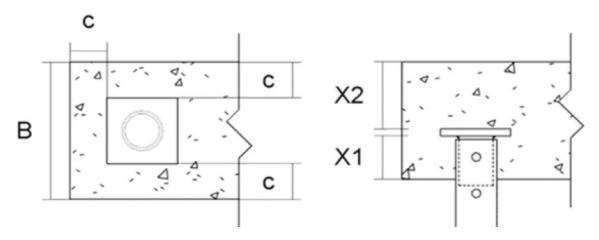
C—CONCRETE FIXED HEAD BRACKET CONCRETE COVERS DIAGRAM
